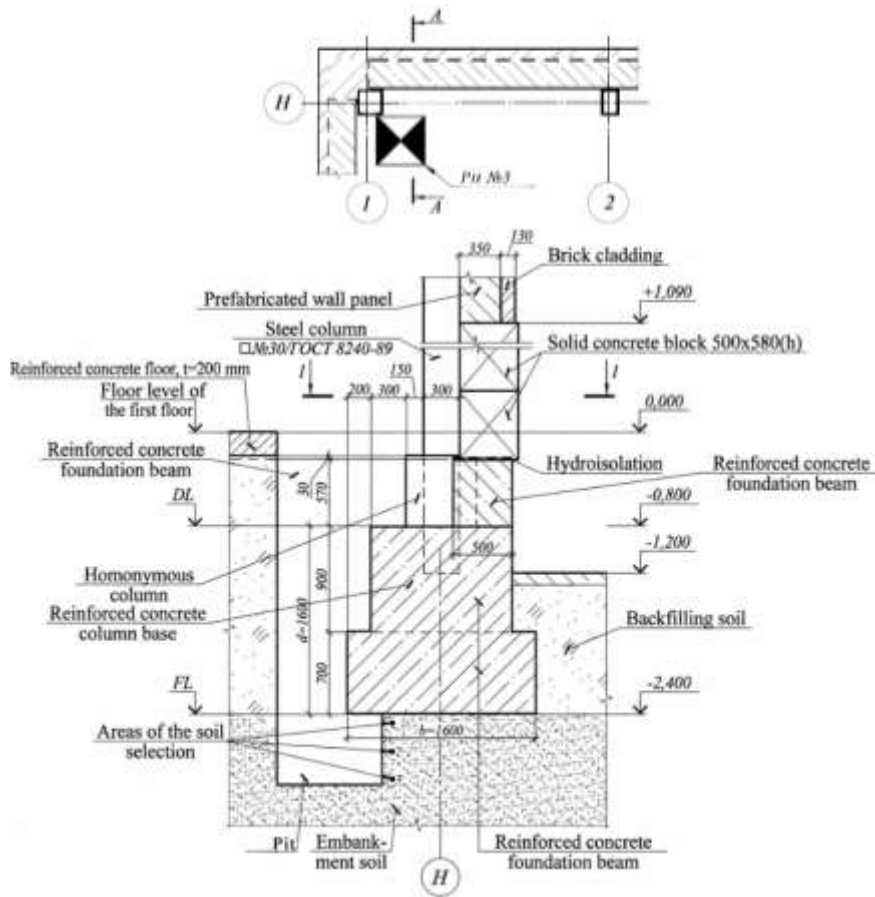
Scheme of the layout of the pit No. 3 and section A-A
